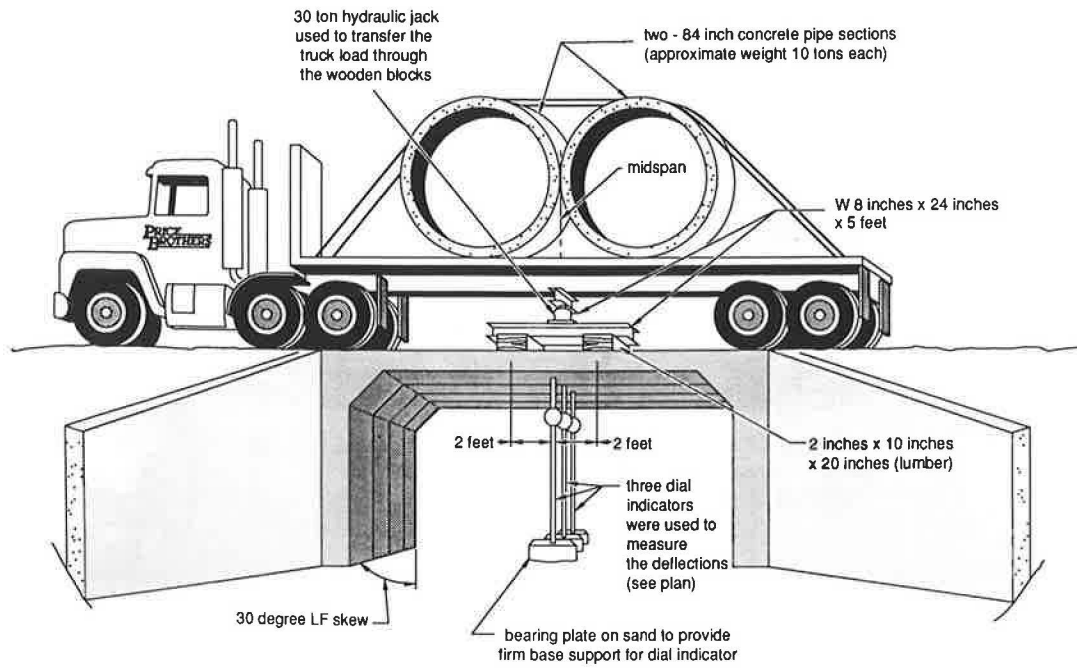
Test 1 (ungrouted without plates) and Test 2 (ungrouted with plates).
